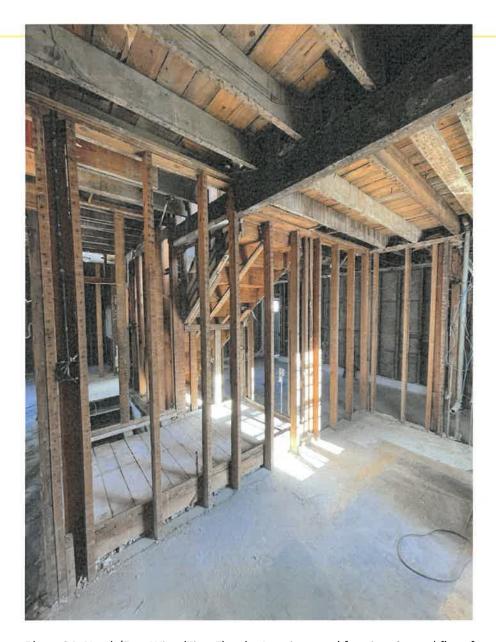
North/East Wing (First Floor) – Interior wood framing. Second floor framing bouncy and significantly not level with 3"+/- dip in floor. Vertical support of north beam end at stair indeterminate. Structural reinforcement of floor framing required.
